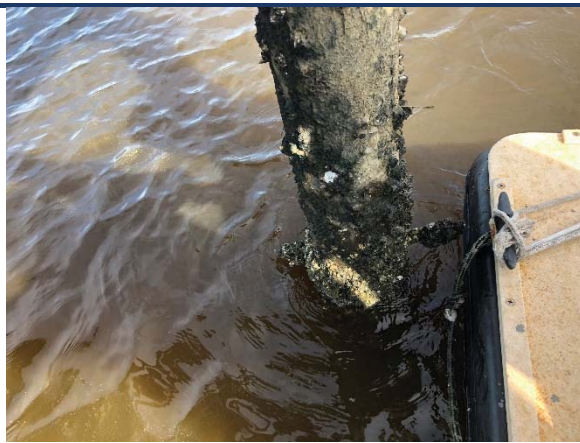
Existing thru bolts at missing lateral bracing at the fishing pier terminus platform
